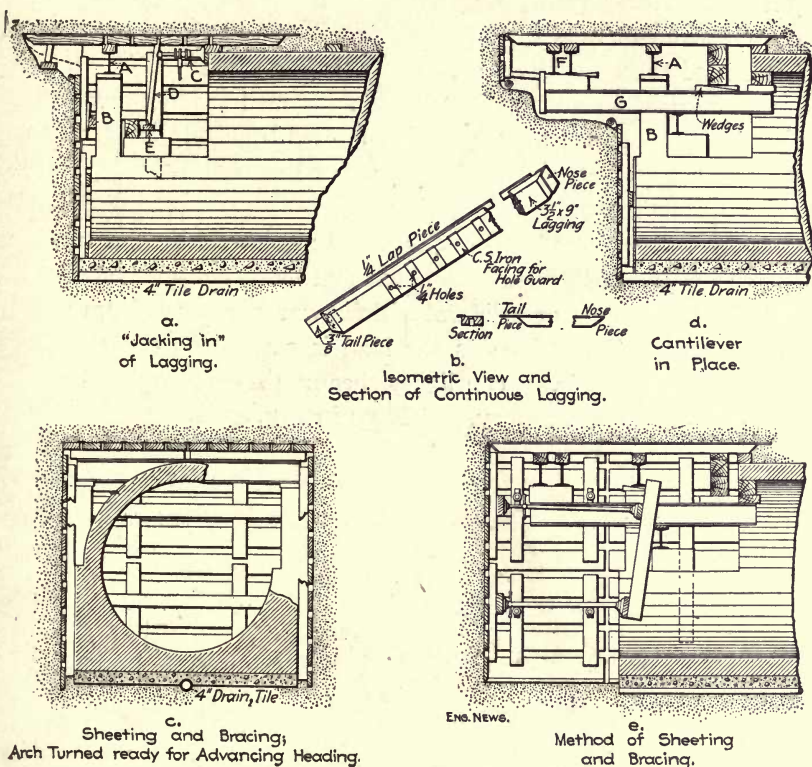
Chatham Square, New York: Driving a Sewer Tunnel Through Sand.
